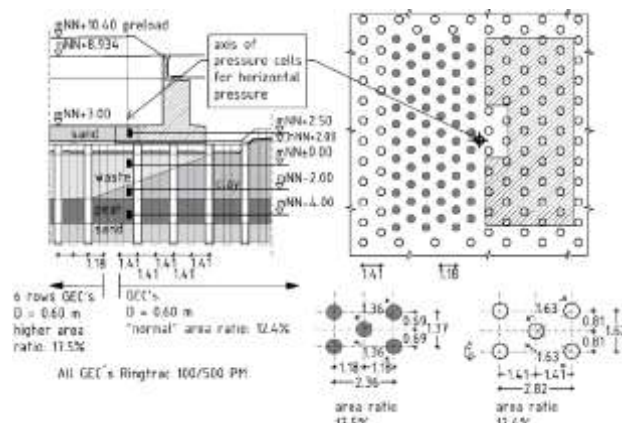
Simplified overview of the GEC foundation adjacent to the Northern bridge abutment; all dimensions in meters; “mNN” means height above mean sea level in meters (for the pre-loading embankment GEC’s have been installed also in the abutment area)
